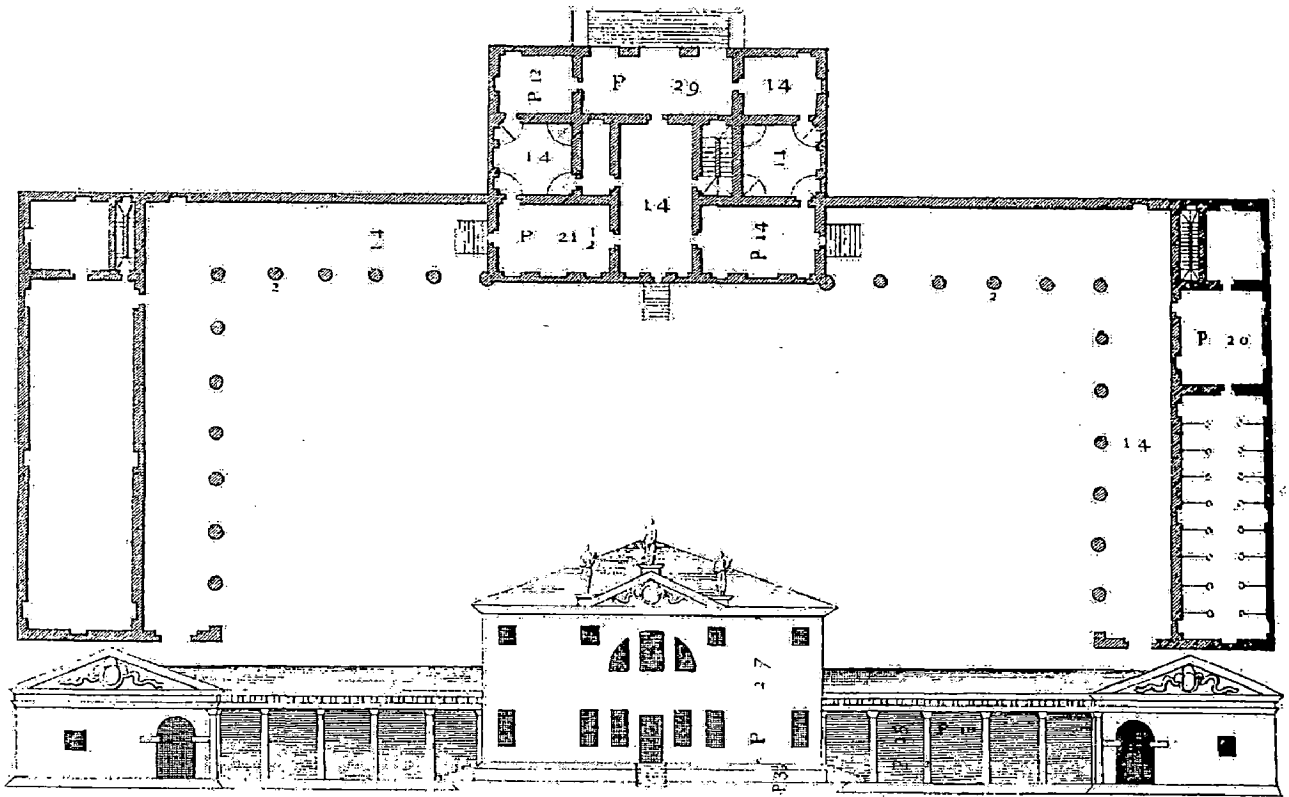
Villa Marco Zeno at Cesalto in plan and elevation
